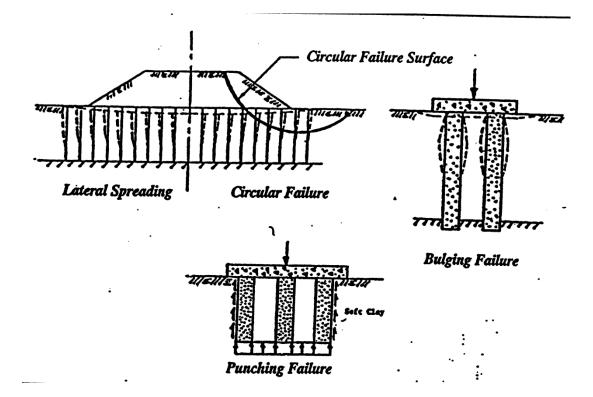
10: Failure Styles of the Group Stone Columns (Barkslade & Bachus, 1983)
